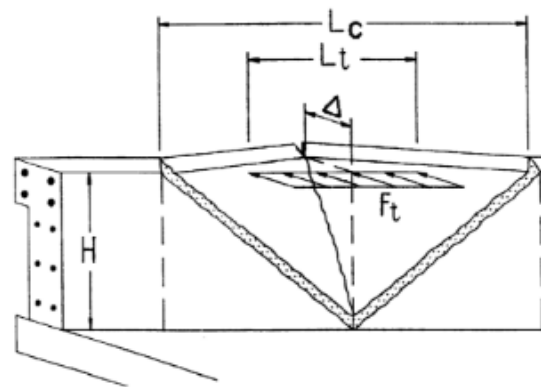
Yield Line Analysis of Concrete Parapet Walls for Impact within Wall Segment
